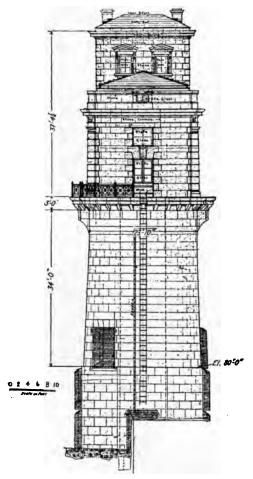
Intake-tower, St. Louis Water Works. (Built 1913–1915.)
